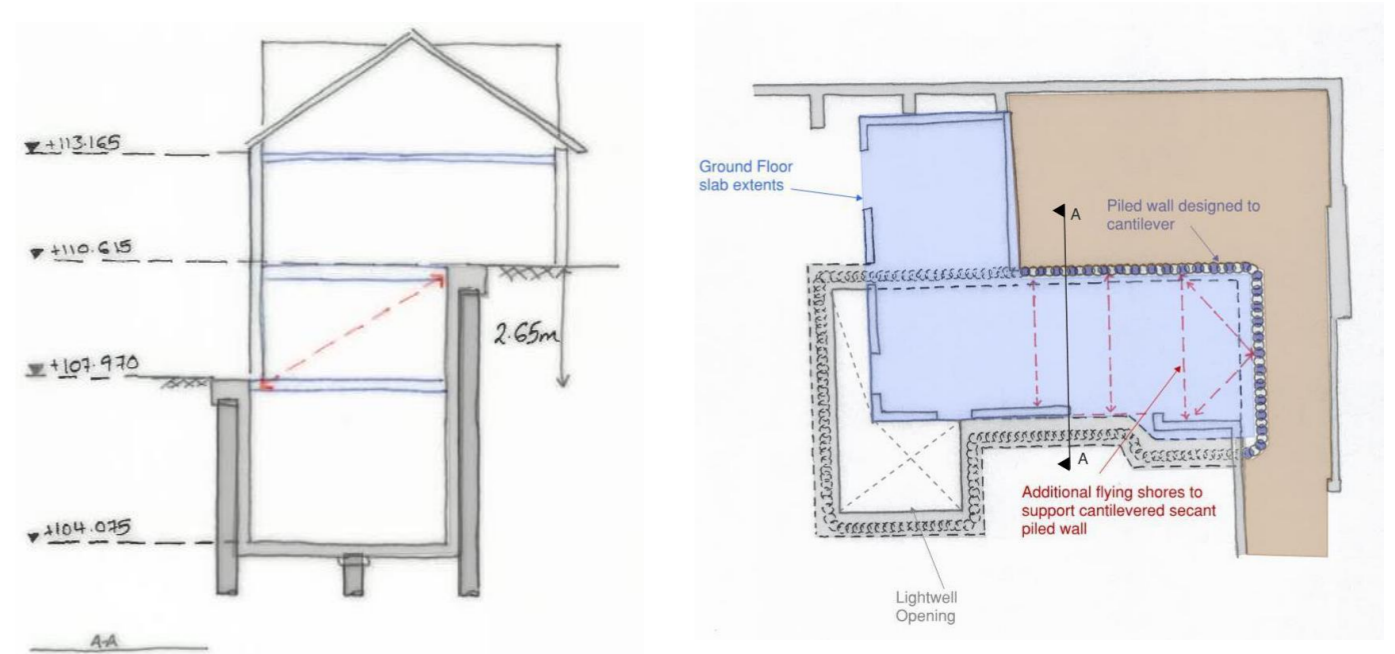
Proposed Temporary Works Flying shores for propped piled wall shown in plan and section
